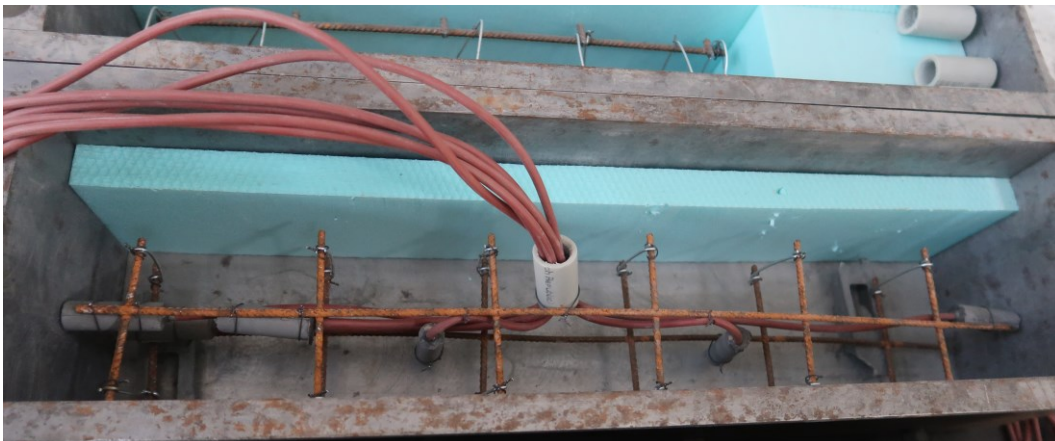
Casing beam ready for concreting, plastic ring protects wires and secures exhaustion position (picture: J. Zatloukal)
